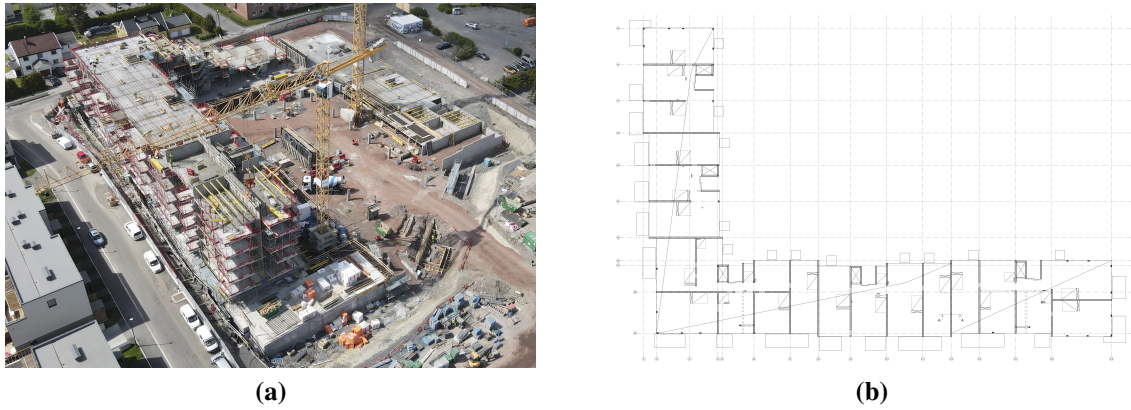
Figure (a) is a picture of the construction site; Figure (b) shows the general floor plan.
